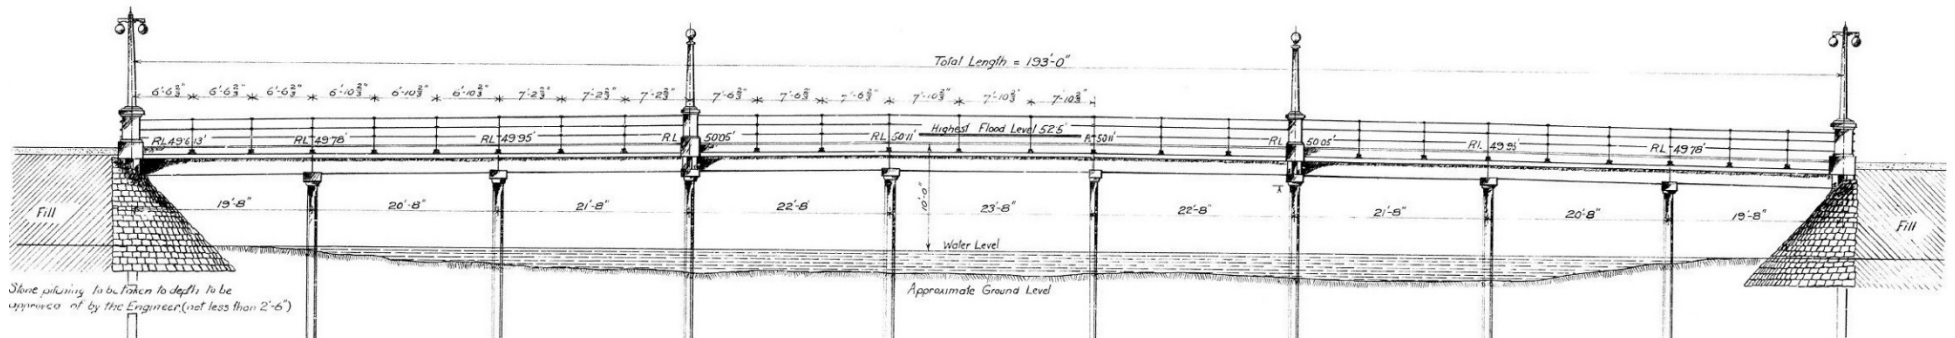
Camp Street Bridge elevation (Source: DMR WAE drawings and FBE)
